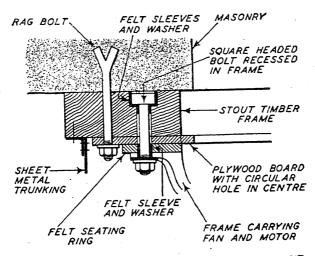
Enlarged view of corner of timber frame for fixing extract propeller fan
